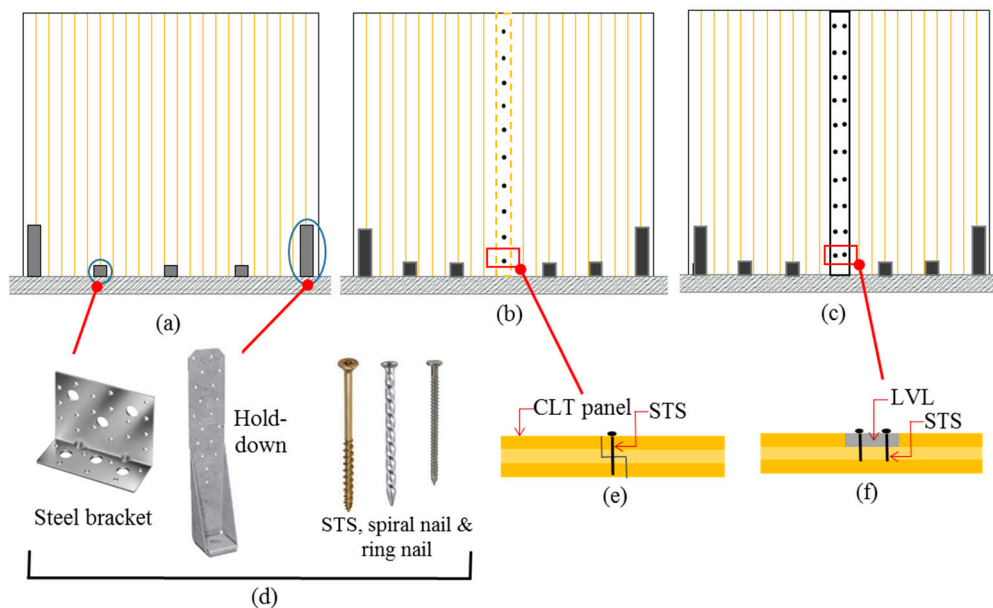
CLT shear walls: (a) single, (b) coupled wall with lap joint, (c) coupled wall with spline joint, (d) connectors and fasteners, (e) half-lap joint, (f) spline joint.
